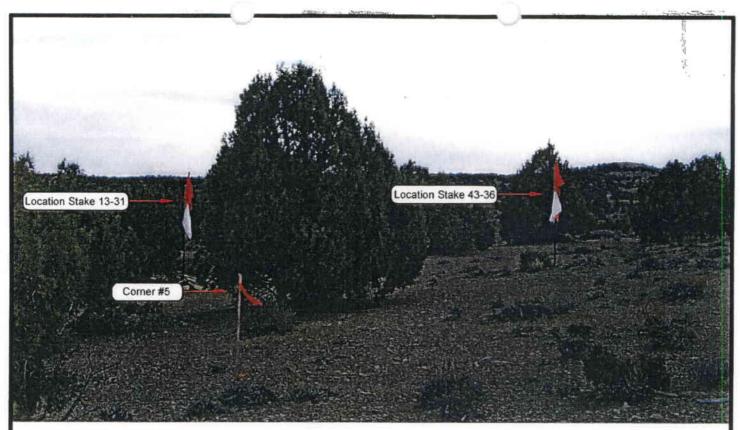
PHOTO VIEW: FROM CORNER #5 TO LOCATION STAKE
